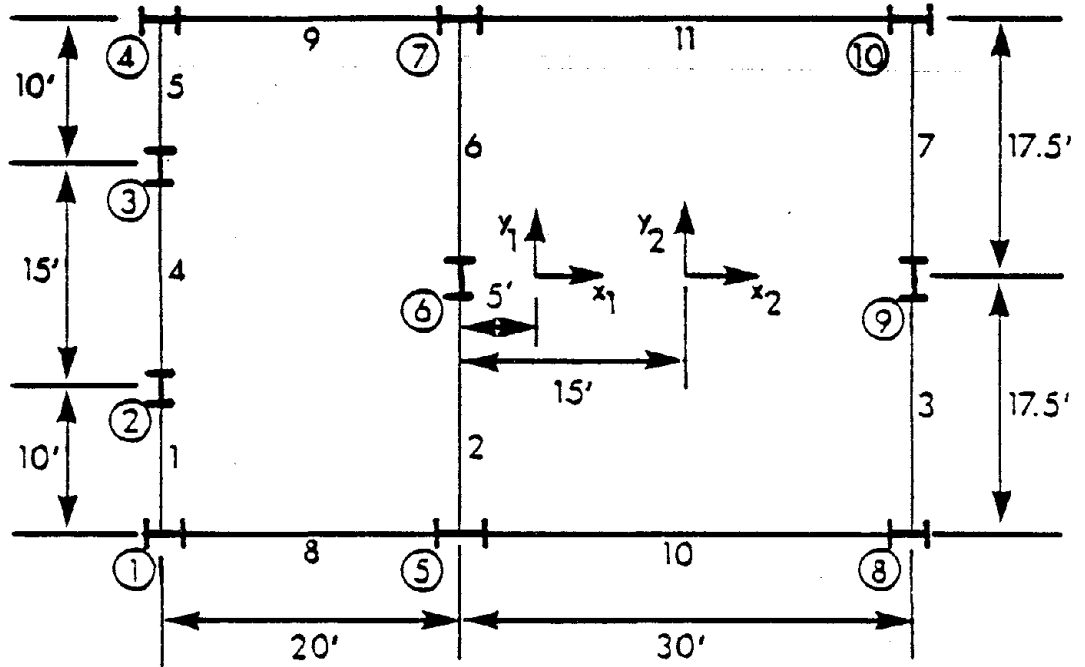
Two Story Steel Setback Structure - Plan View (1' = .305m)
